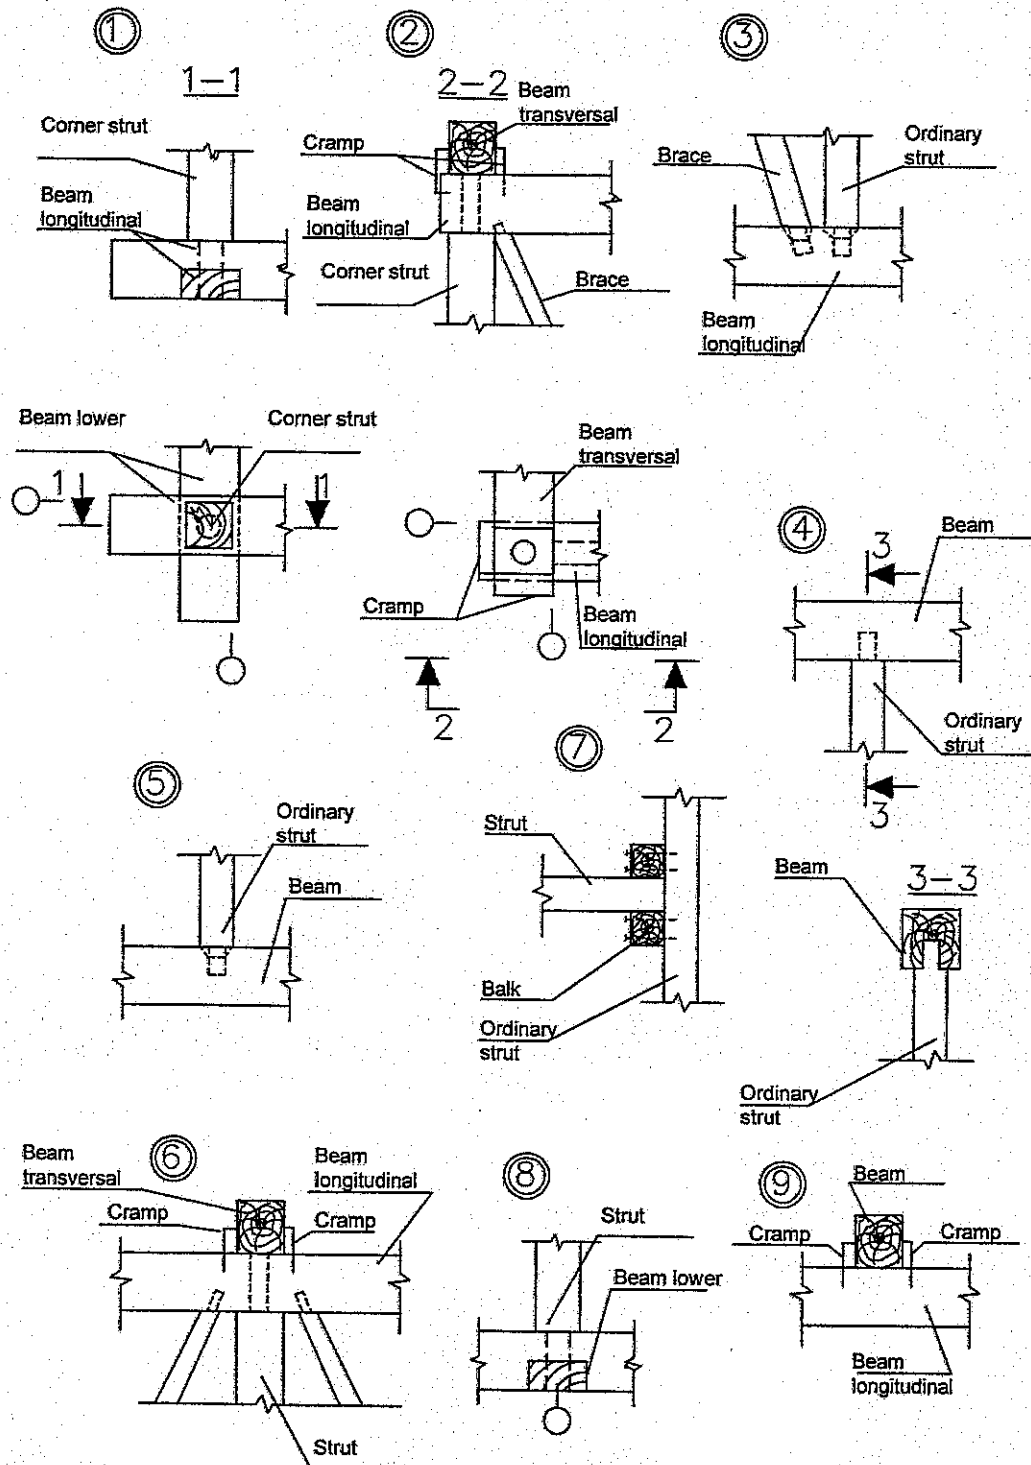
Typical joints of wooden frame "synch" of one storey buildings from adobe materials
